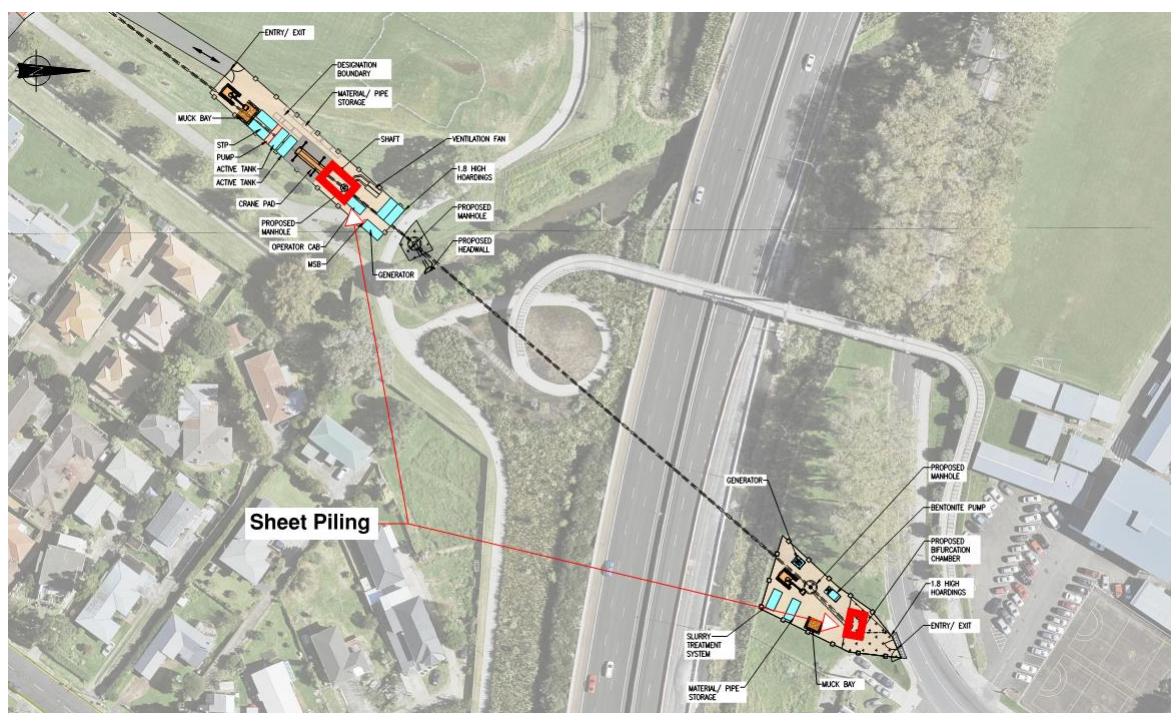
Sheet Piling Location – Branch 9B North and Frost Road Sites (sheet piling location shown in red)
